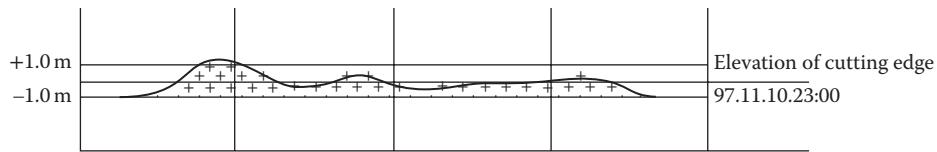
Elevation one—foot blade and riverbed (Wuhu Yangtze River Bridge double-wall steel cofferdam construction).
